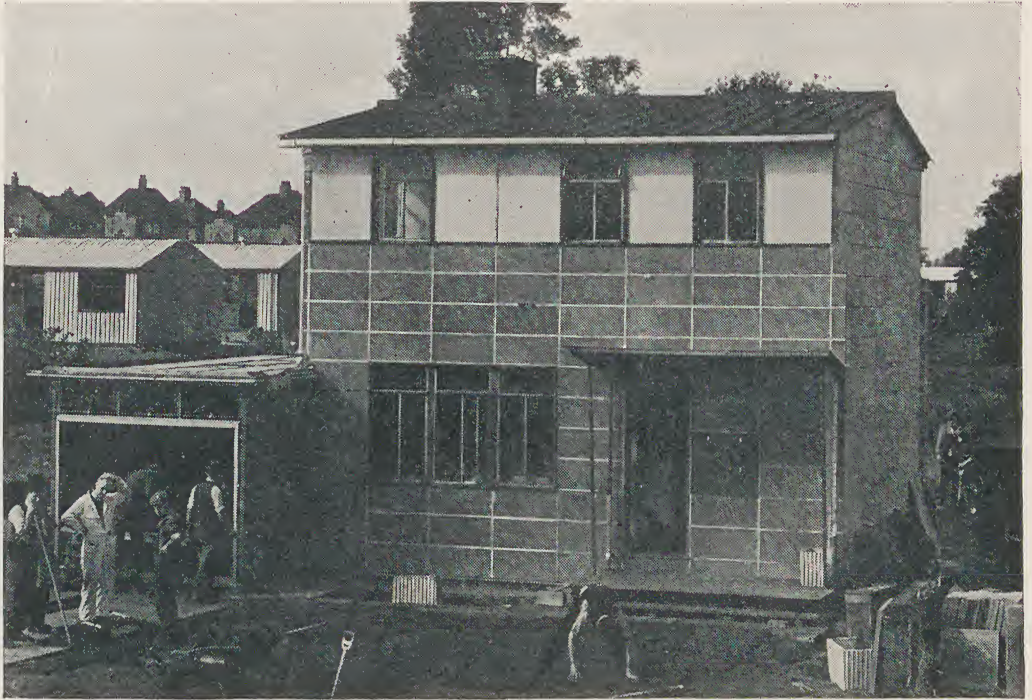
Prefabricated steel-framed house, Coventry. D. E. E. Gibson, City Architect.
